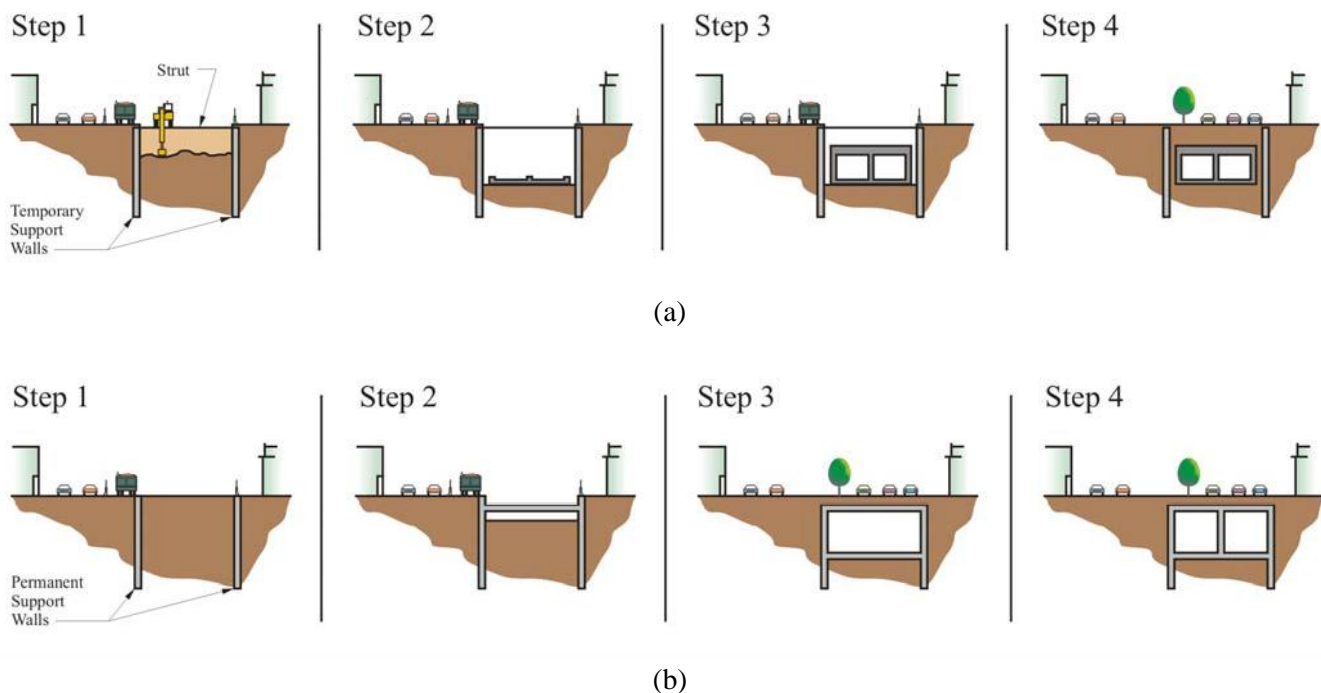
Cut-and-Cover Tunnel Bottom-Up (a) and Top-Down (b) Construction Sequence
